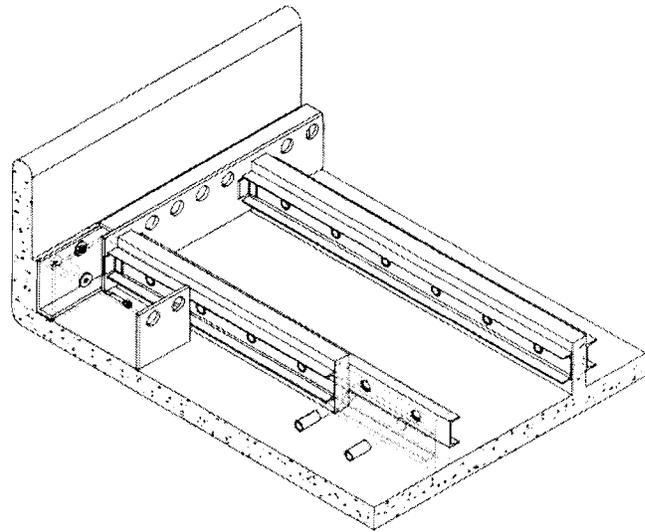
Partial isometric of main beam and sister joists in steel solution.
